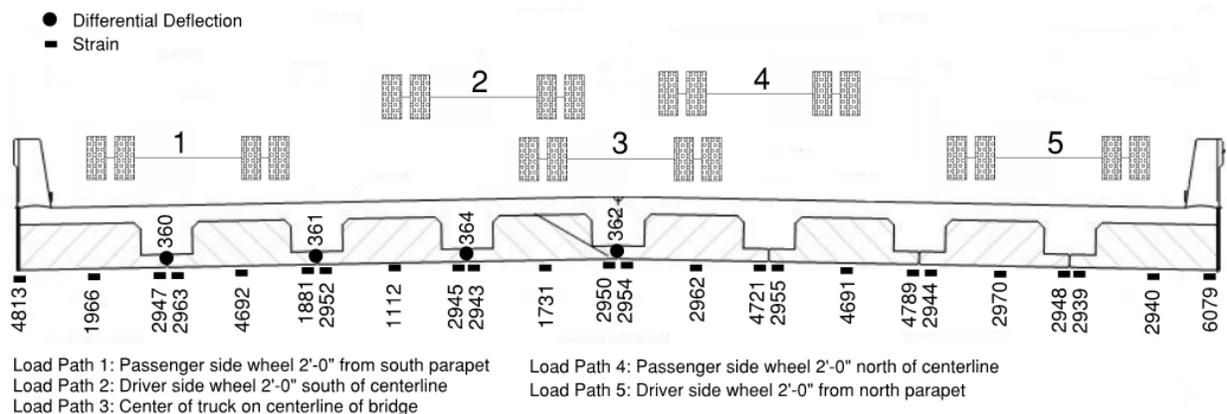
STH 19 over Token Creek load path and gage positions – looking west
